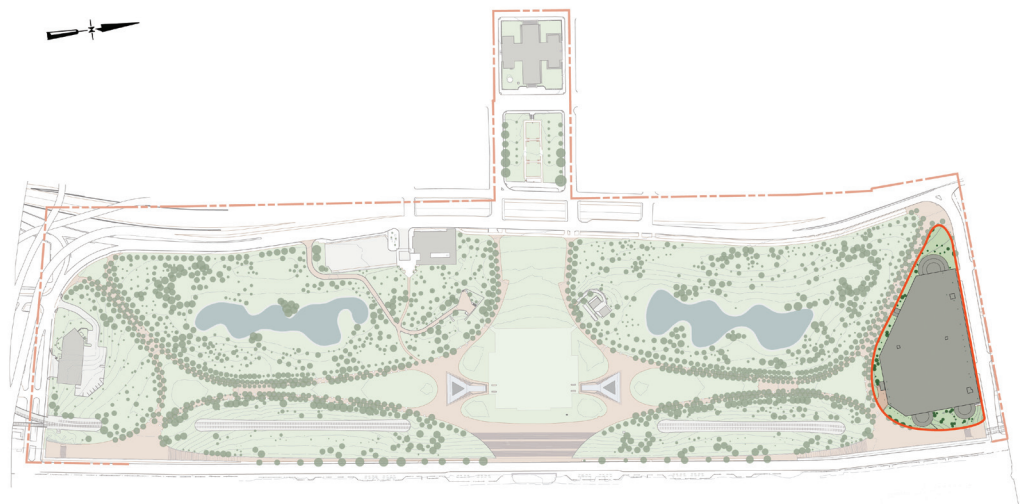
Project 8: Redesign Parking Garage Plantings to Align with Planting Design of Larger Memorial Landscape.
